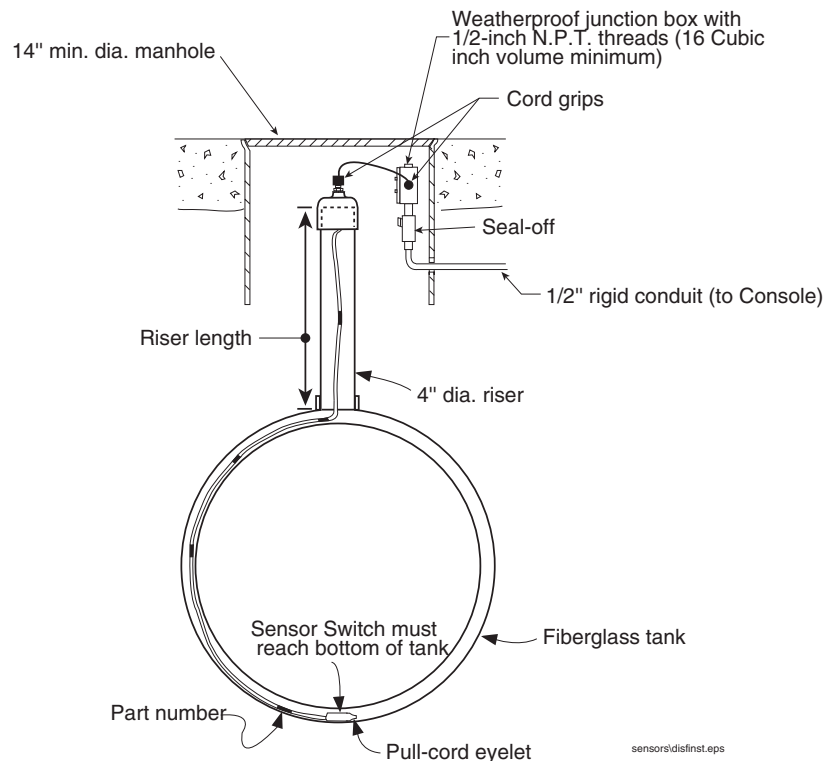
Sensor Dimensions and Installation Requirements - Fiberglass Tank
